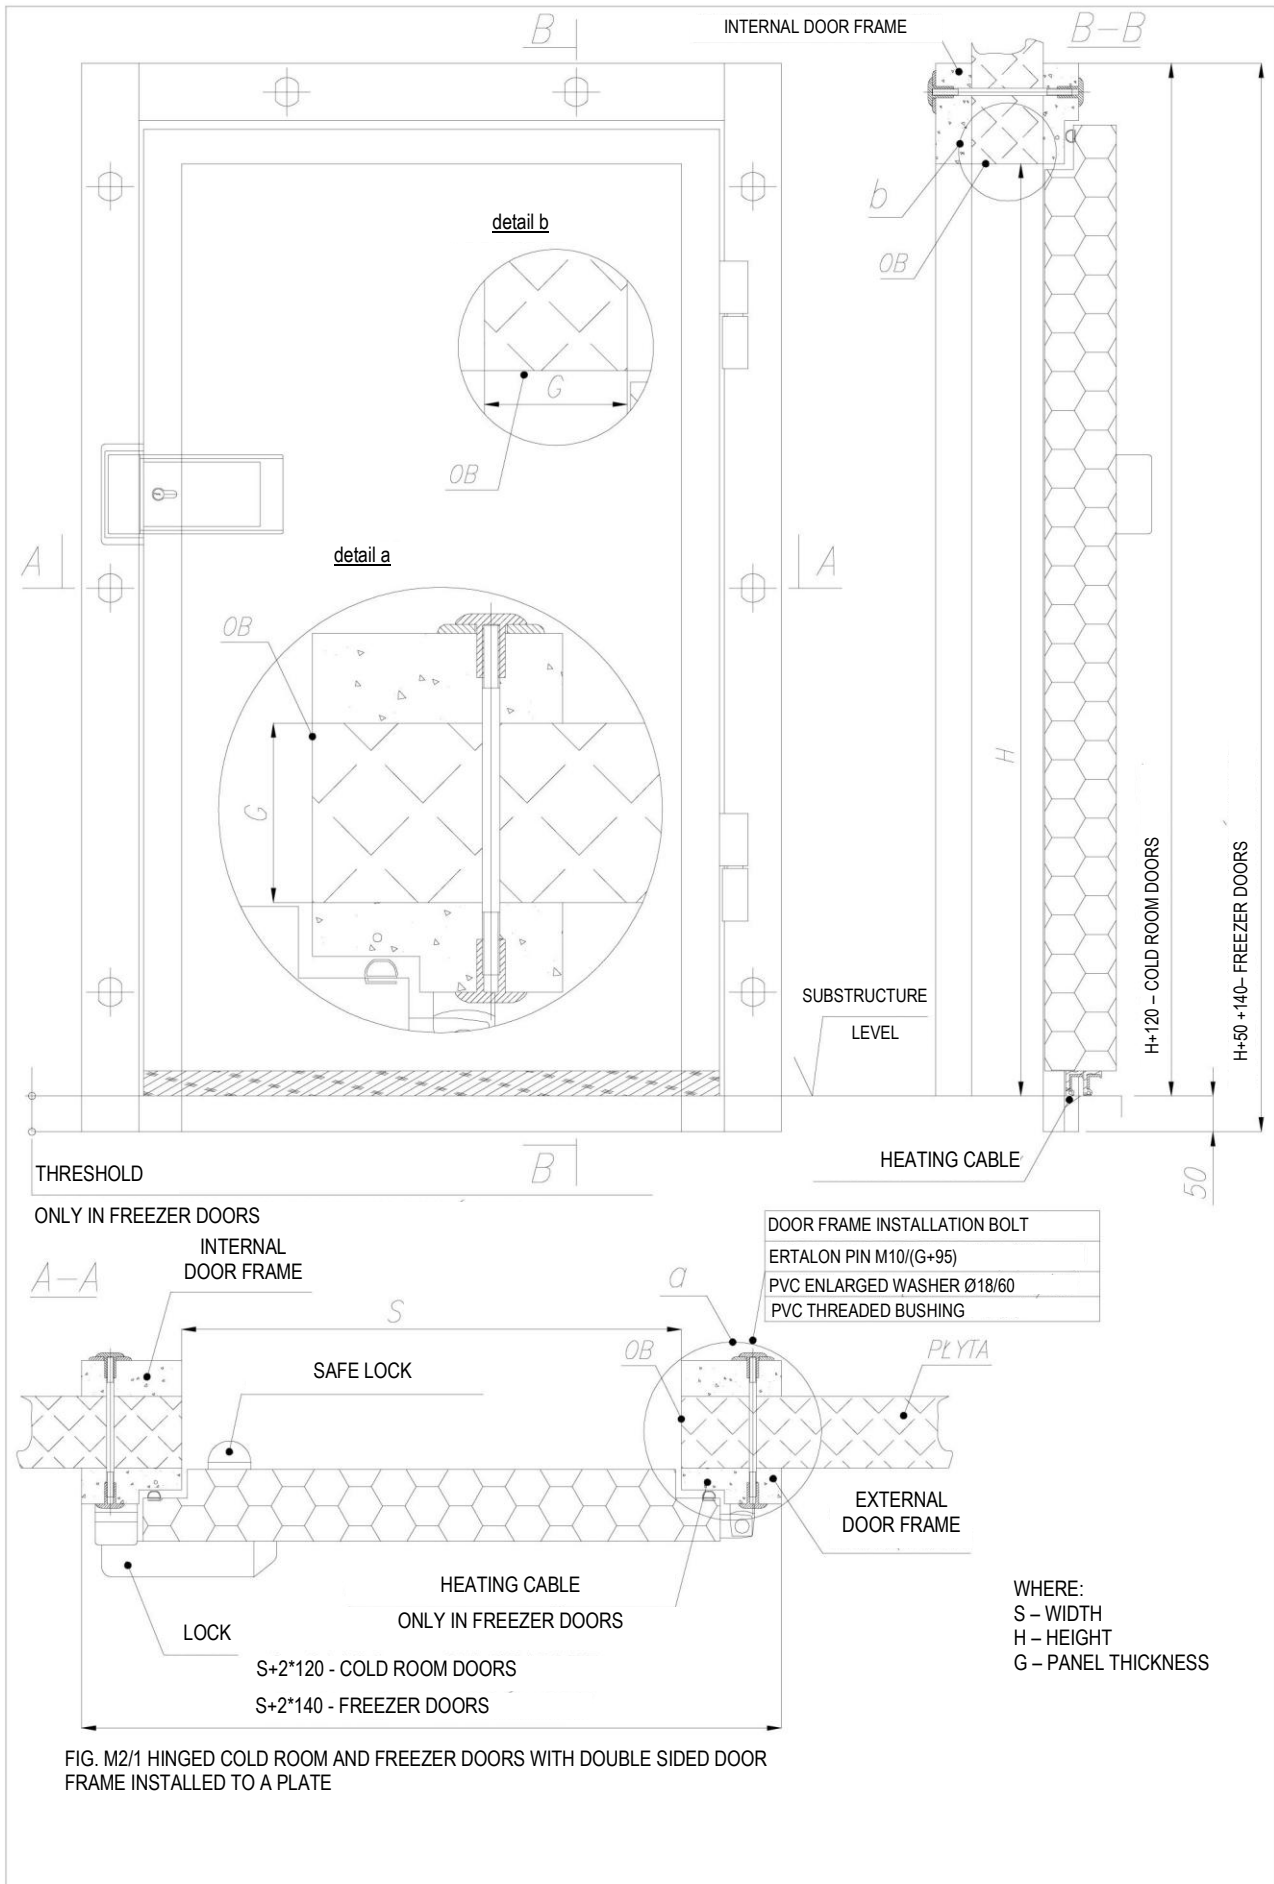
/1 HINGED COLD ROOM AND FREEZER DOORS WITH DOUBLE SIDED DOOR FRAME INSTALLED TO A PLATE
